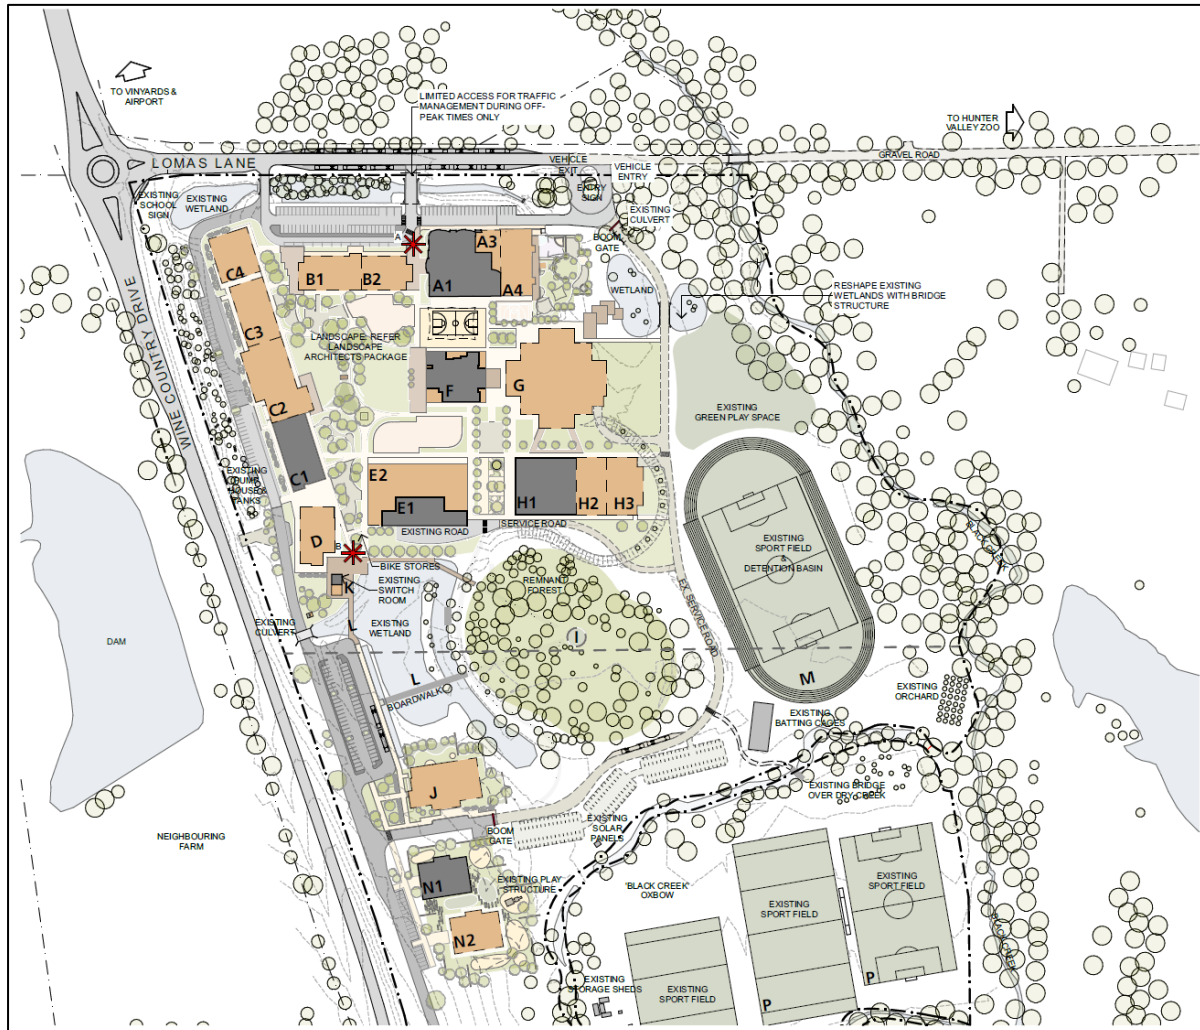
Proposed Site Plan – North. Source: SHAC 2022
